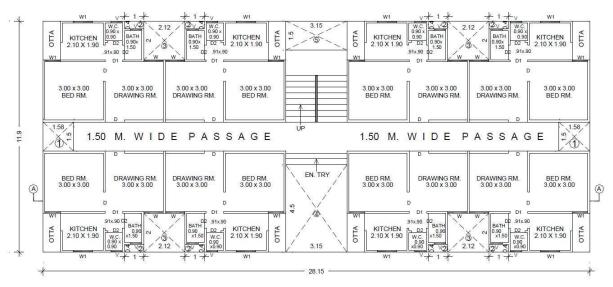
Ground Floor Plan of Houses provided to the urban poor under BSUP Source: (Ministry of Housing and Urban Poverty Alleviation - Government of India, 2005)
